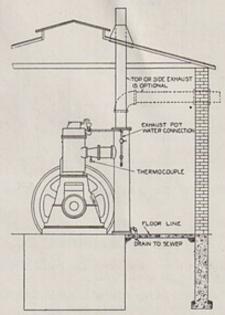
Exhaust Pot Arrangement (99YKA63)
